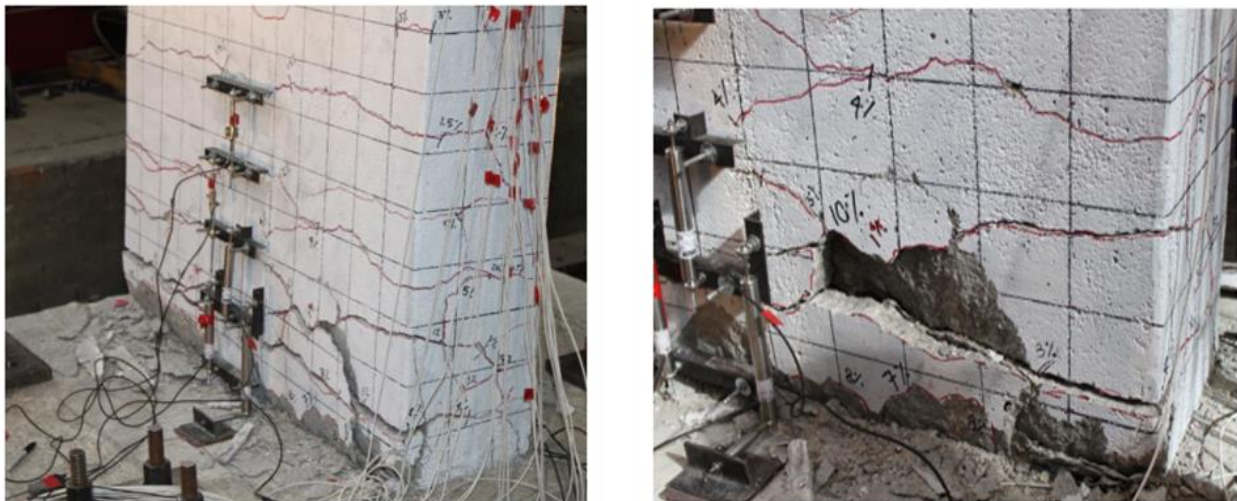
Damage state at 10% drift ratio showing cracks and spalling and rebar fracture: (a) east face, (b) west face
